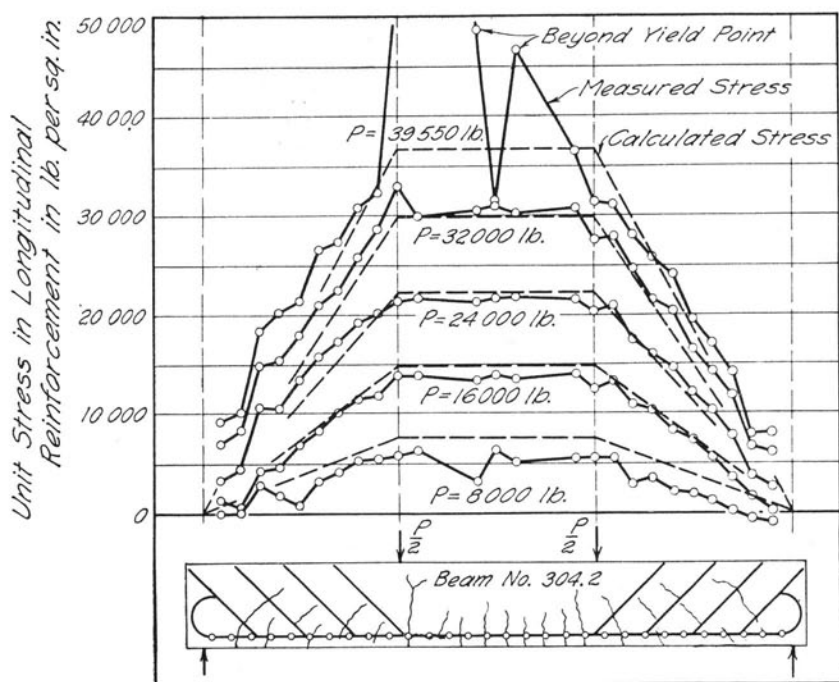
MEASURED TENSILE STRESSES IN LONGITUDINAL REINFORCEMENT OF BEAM 304.2, SERIES OF 1913
